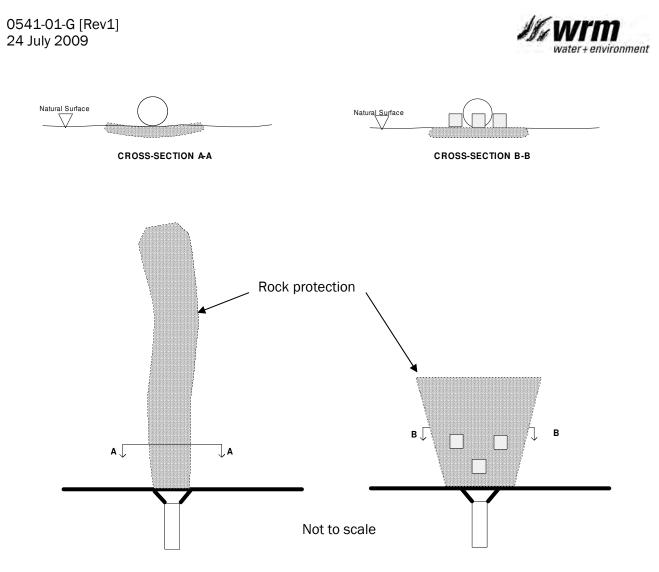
Conceptual Illustration of Erosion Protection Options for Stormwater Pipe Outlets to Flat Land
